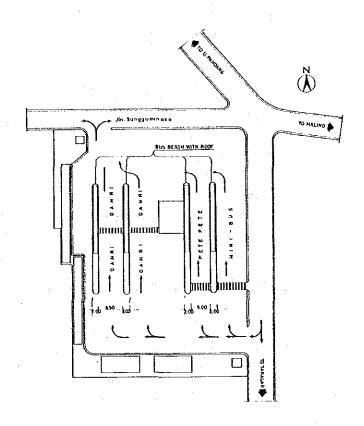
Terminal Sungguminasa Improvement Plan
